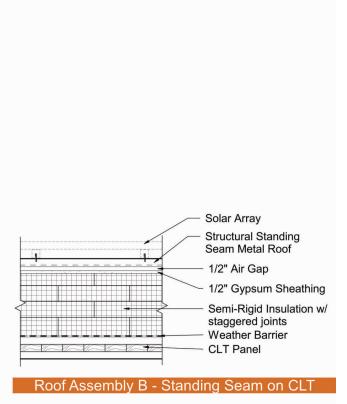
TYPICAL ROOF ASSEMBLIES
